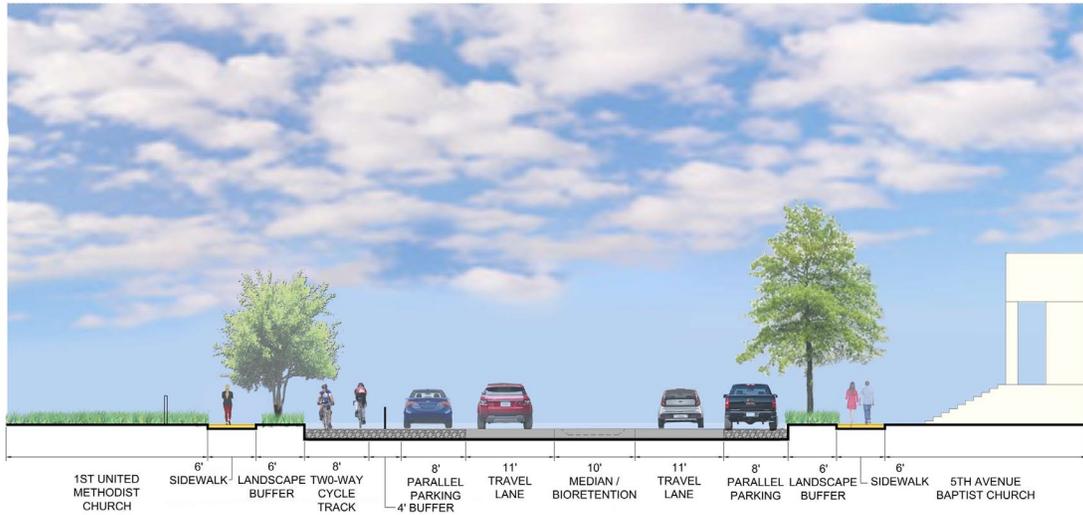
5th Avenue Complete Street Part 2 (10th Street to 13th Street)
